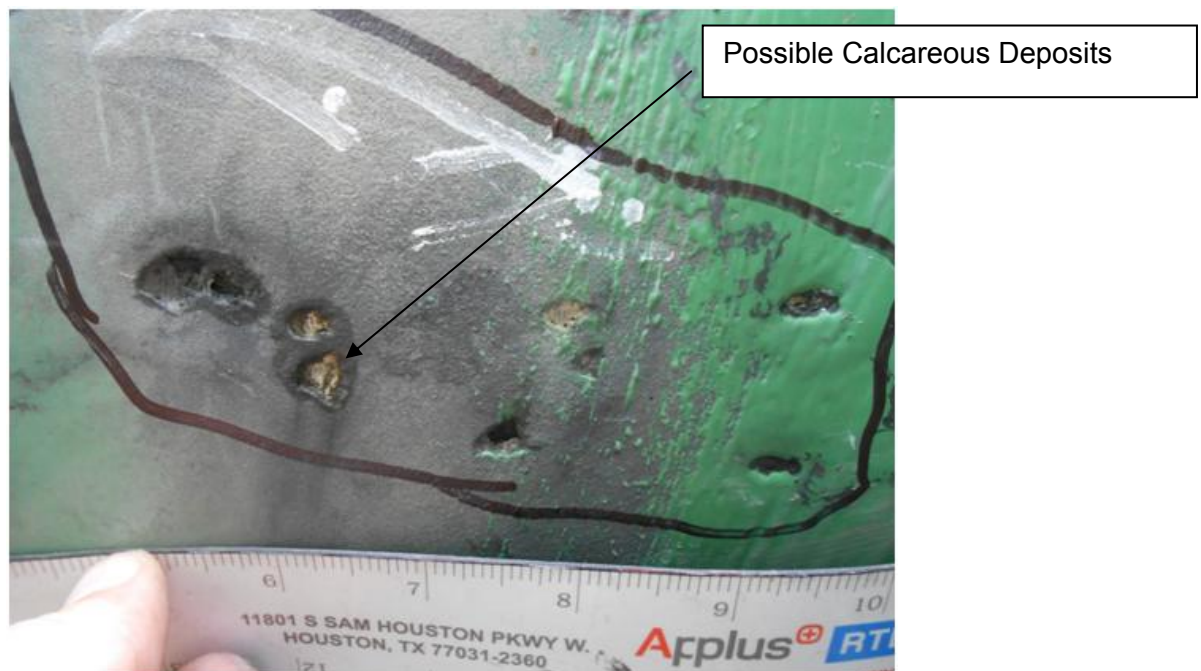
MP 995.95 External Corrosion Pitting
